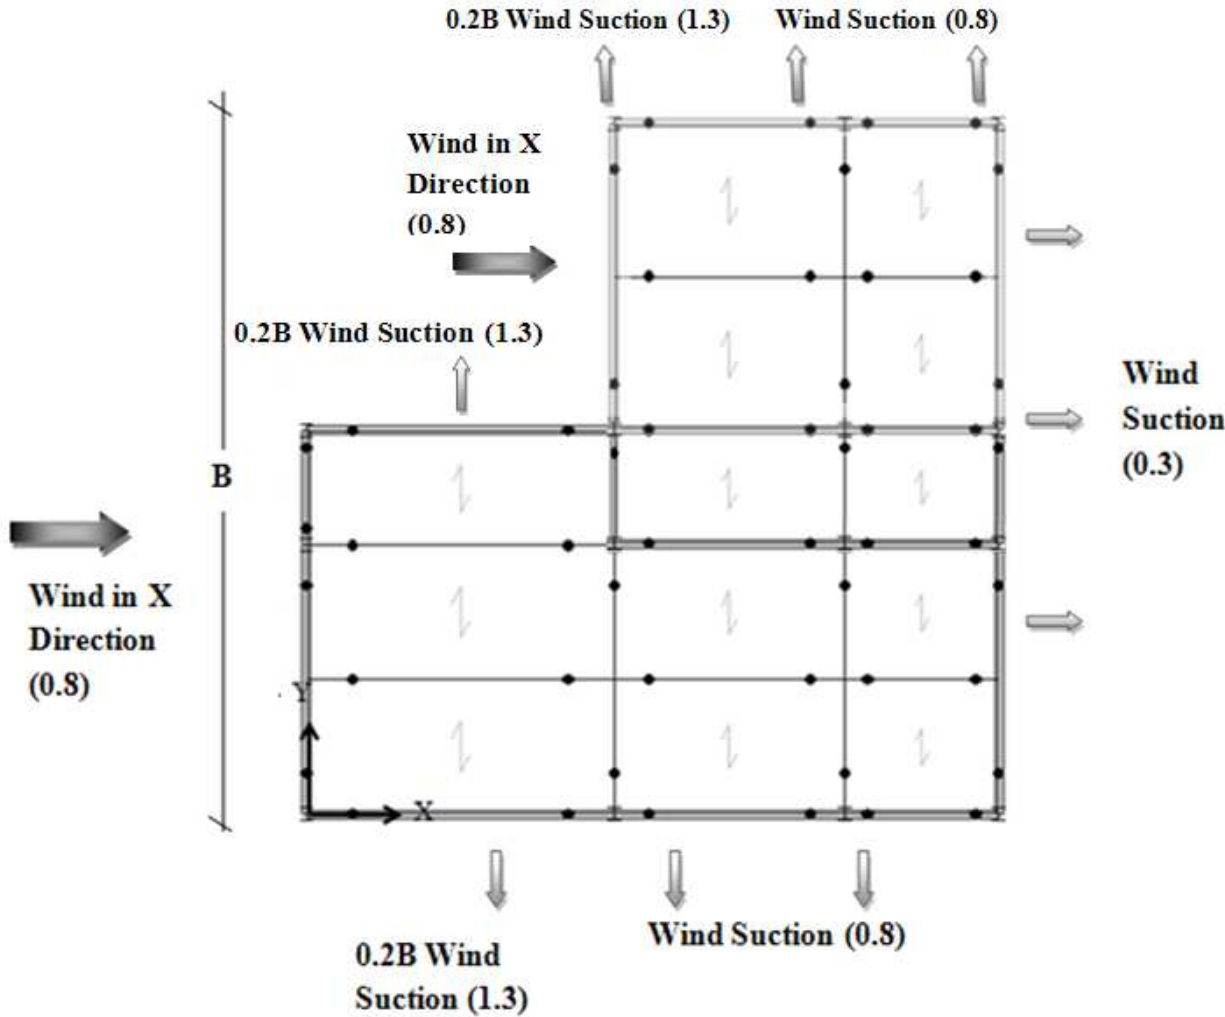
(a): Building layout indicating wind in X direction with suctions for asymmetrical plan and section.
